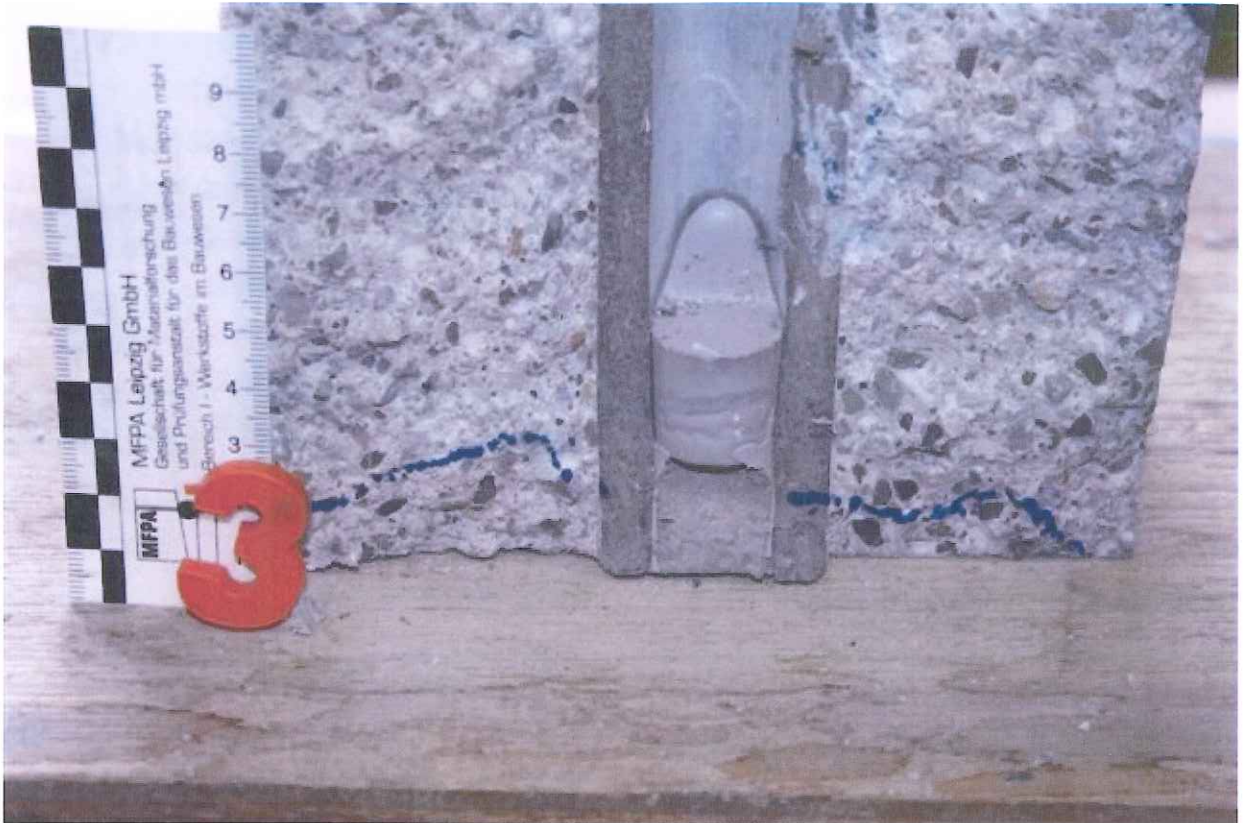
Series A 'FRANK fibre-reinforced concrete distance tubes – MR 22 each sealed with two fibre-reinforced concrete plugs St220020, sample 3
